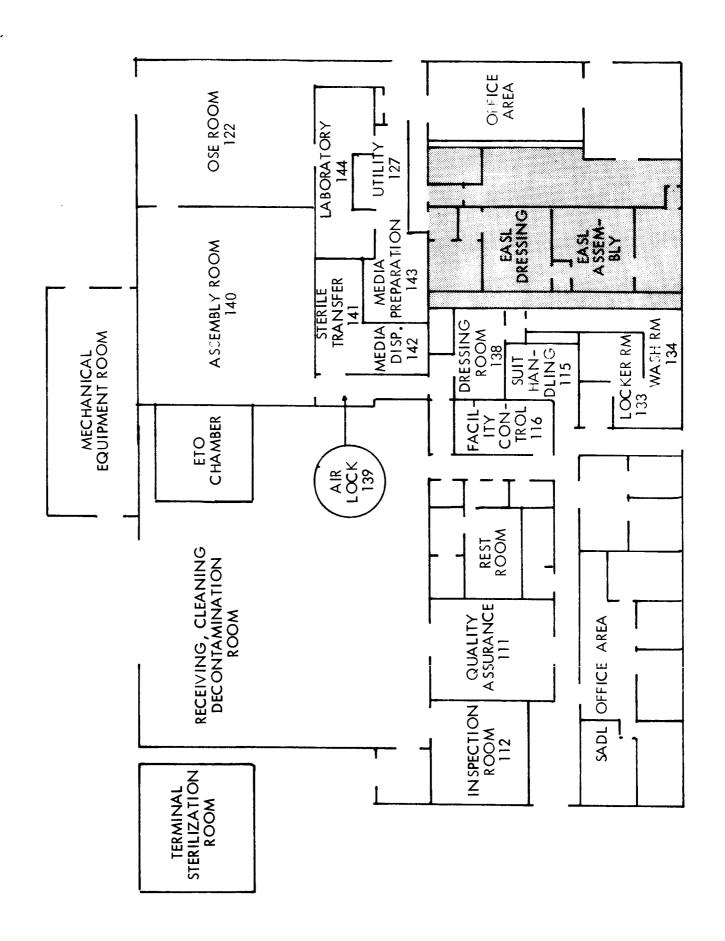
STERILIZATION ASSEMBLY DEVELOPMENT LABORATORY FLOOR PLAN
